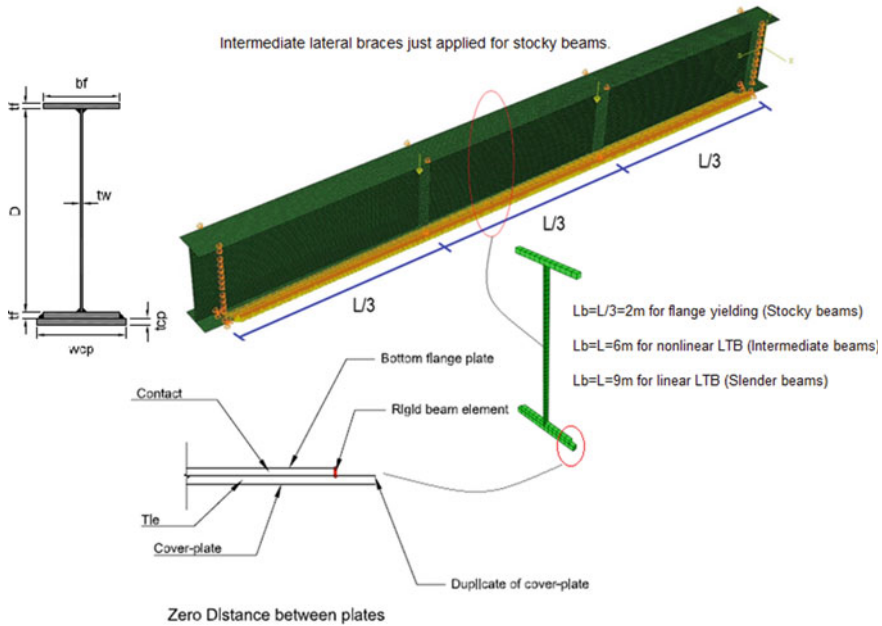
Details of developed finite element model and schematic view of the reinforced I-beam
